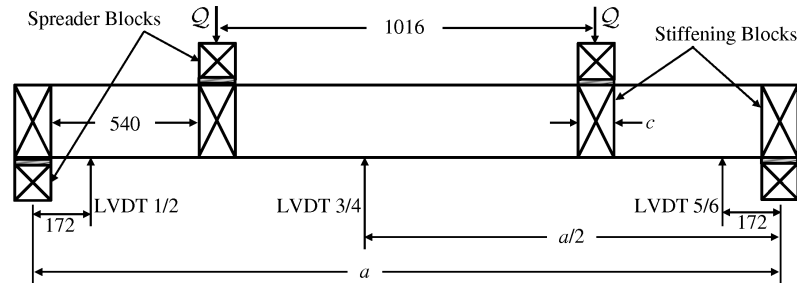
Dimensions and setup for the shear buckling test (all dimensions in mm)
